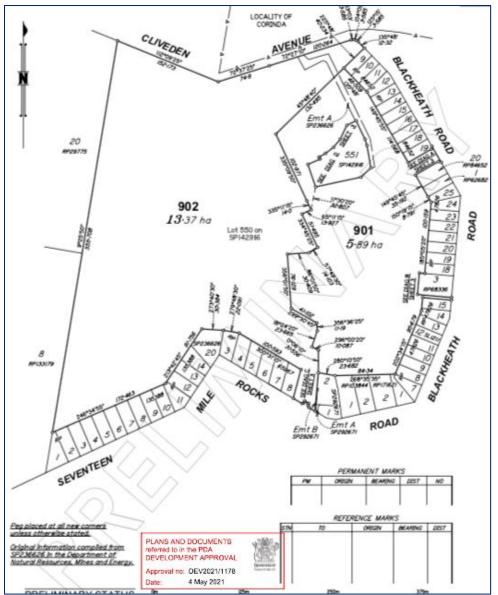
Approved Subdivison Plan (Source: LandPartners)
